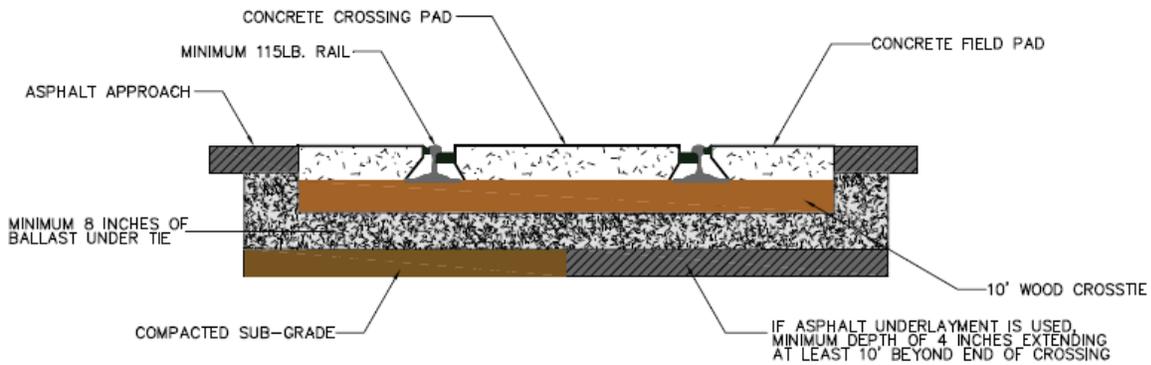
Exhibit C At-Grade Crossing Layout Plan / Cross Section
